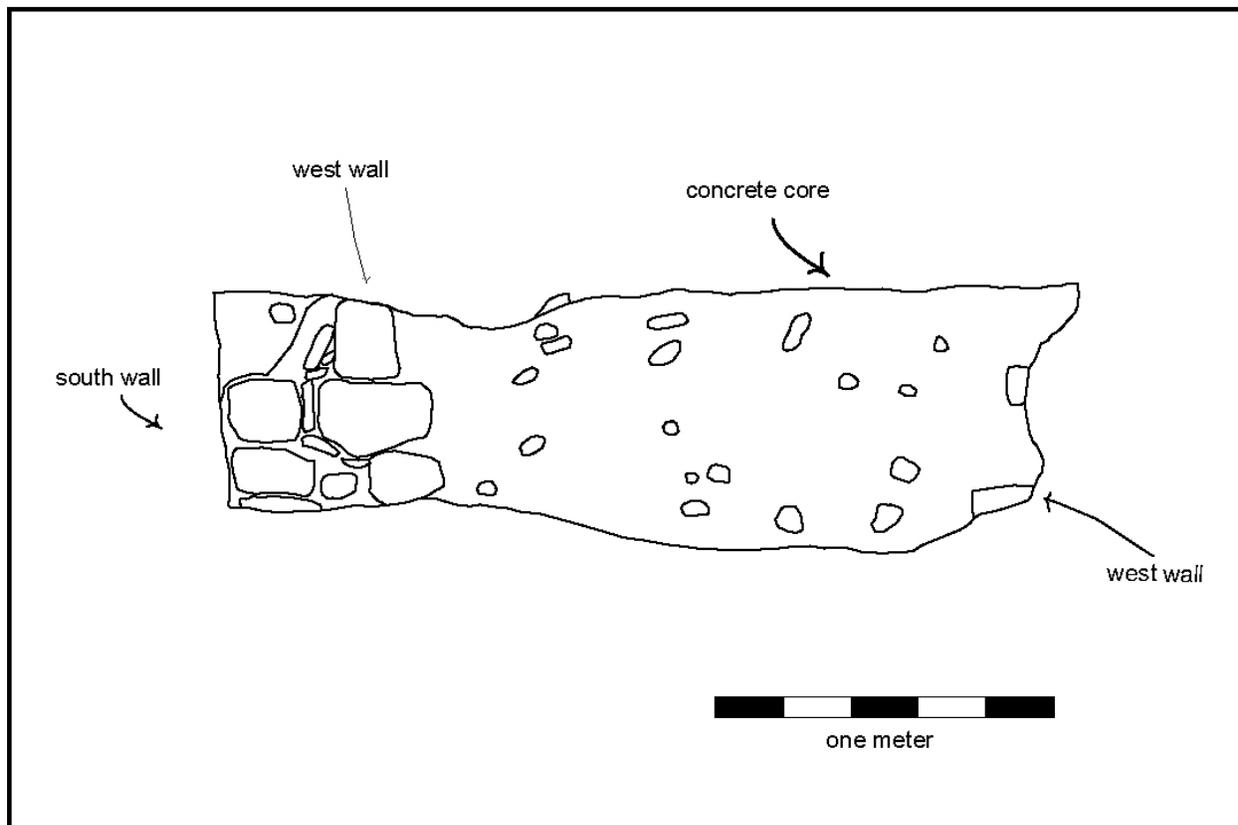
West Profile of Exposed Room in Sacalaca's Structure S5E5-2
